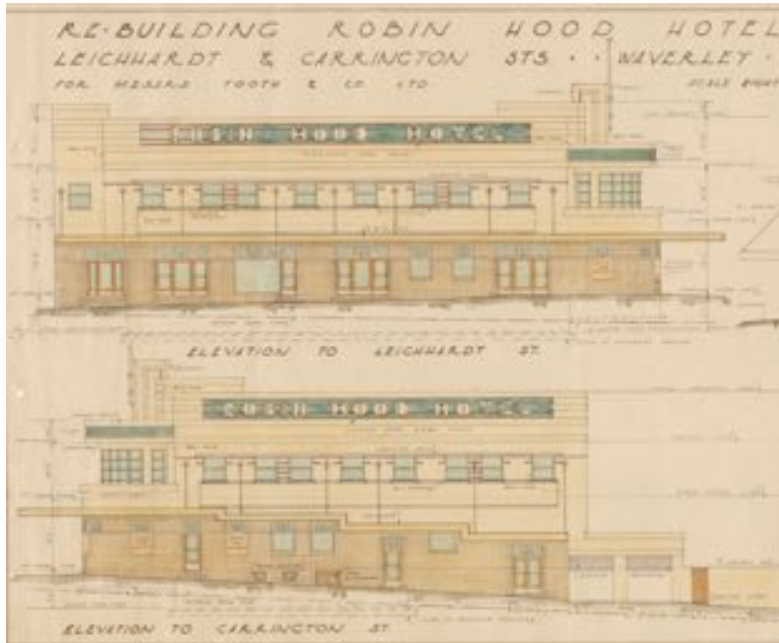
Re-Building Robin Hood Hotel, elevations as designed.
